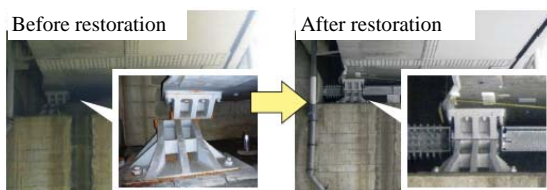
Bridge girder displacement • damage on a bearing
